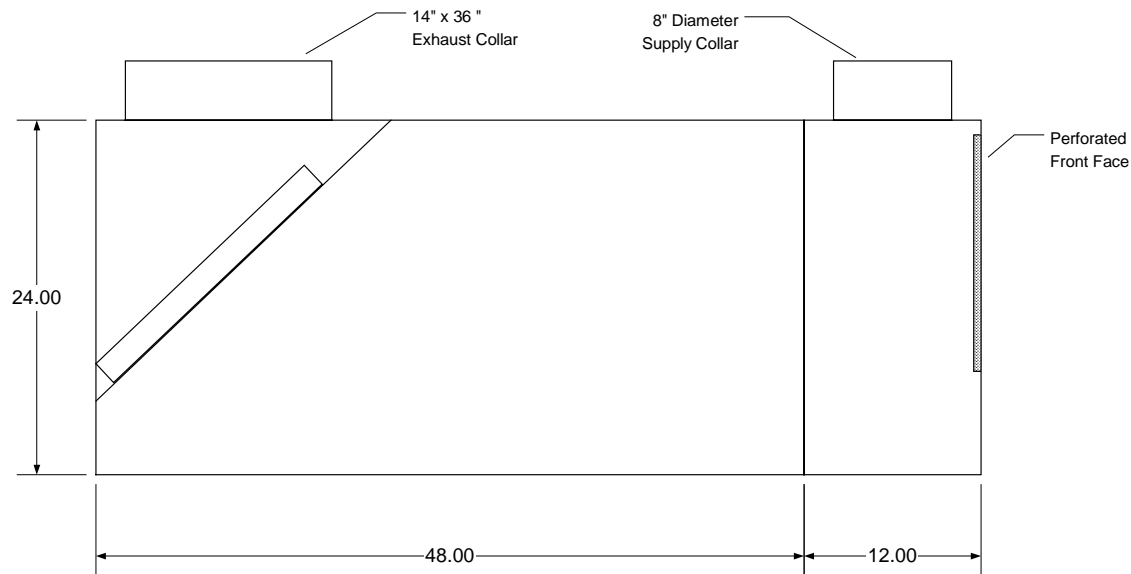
Cross-Section Drawing of Front Face Plenum and Canopy Hood
